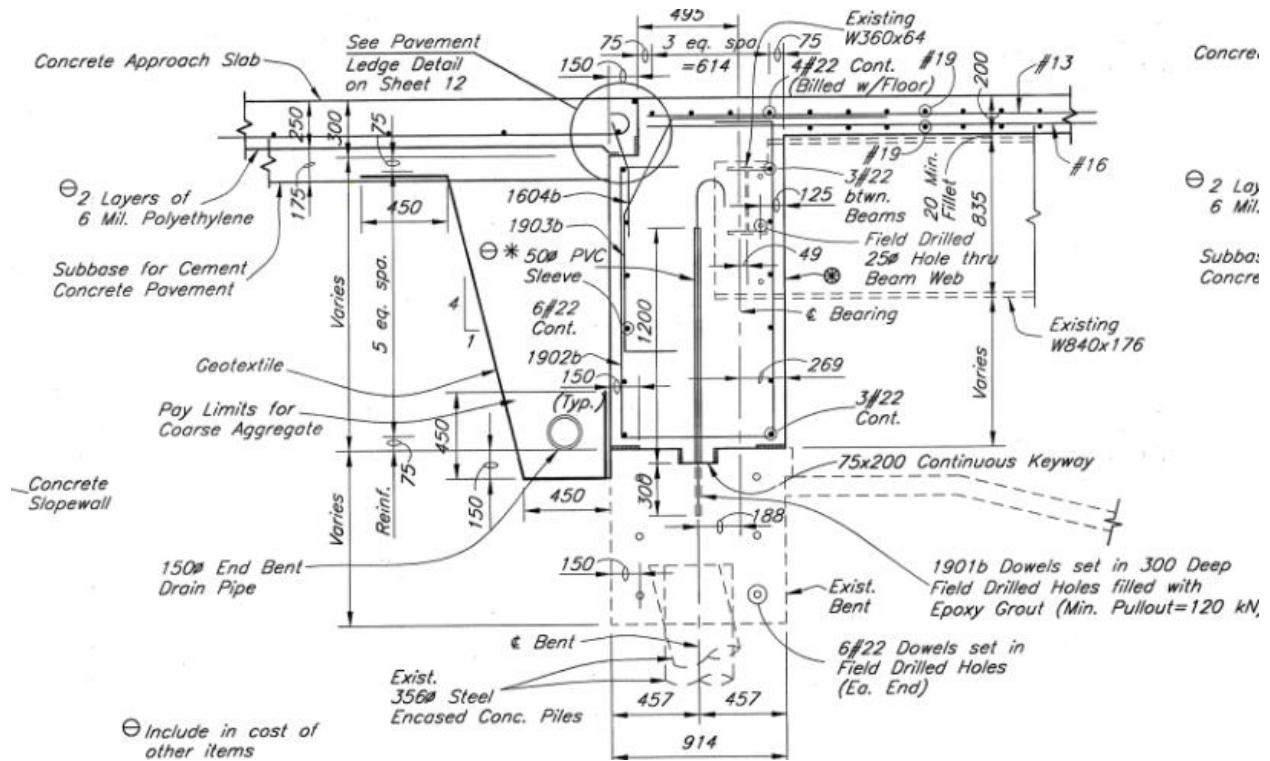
Abutment Detail of the Bridge (NBI 36890) (2001)
